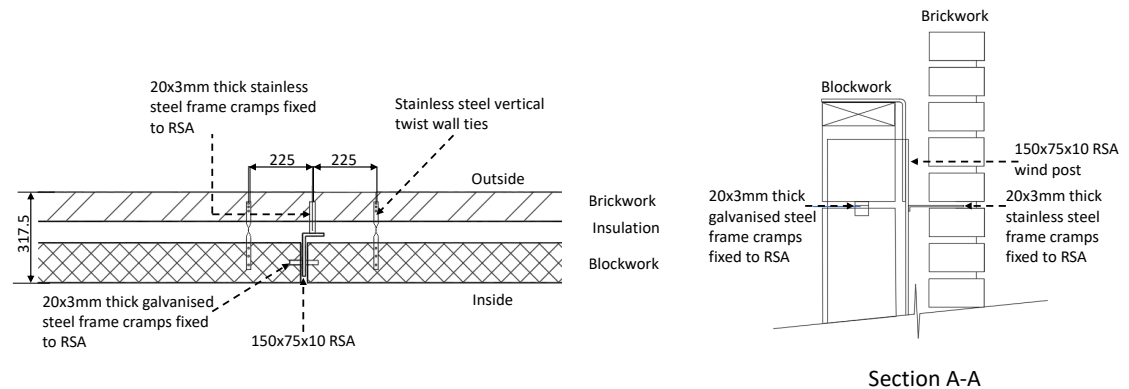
Section of steel (a) plan view and (b) elevation view
